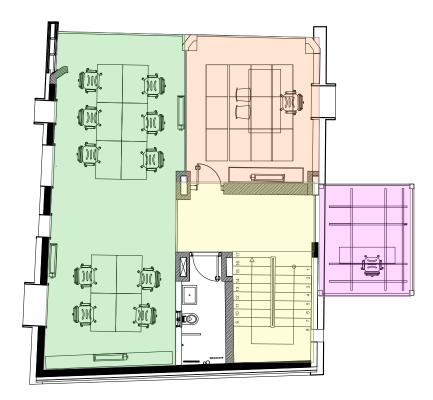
The ERKE Desing Office, First Floor Layout
